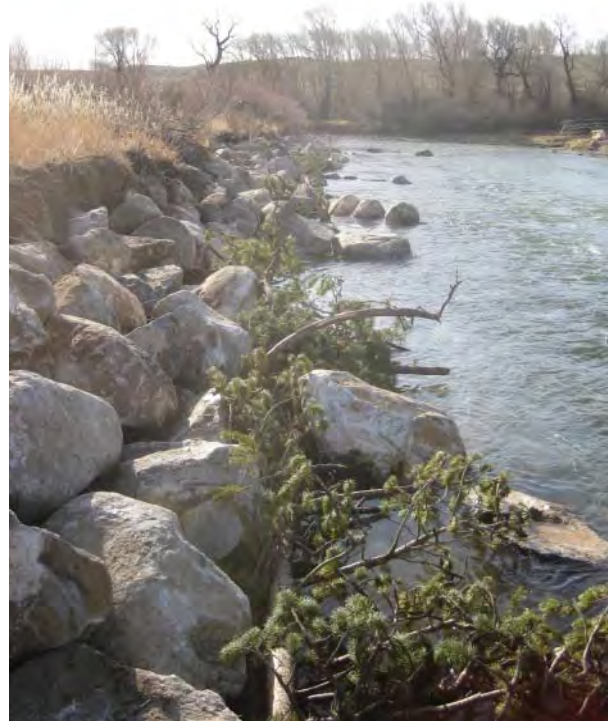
Looking downstream on the Wind River after installation of trees and rock revetments to protect the eroding stream bank.
